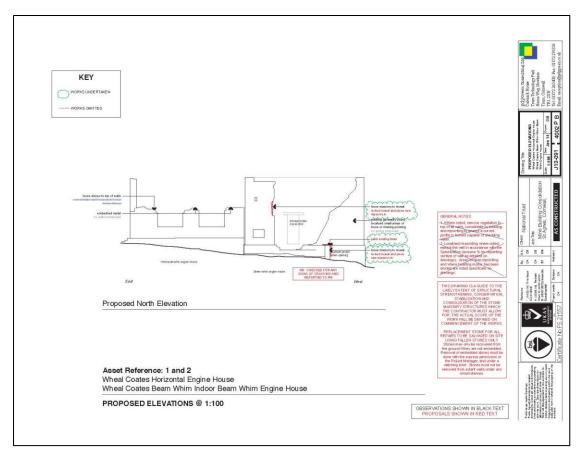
Northern external elevations of Wheal Coates horizontal engine house and beam whim.
